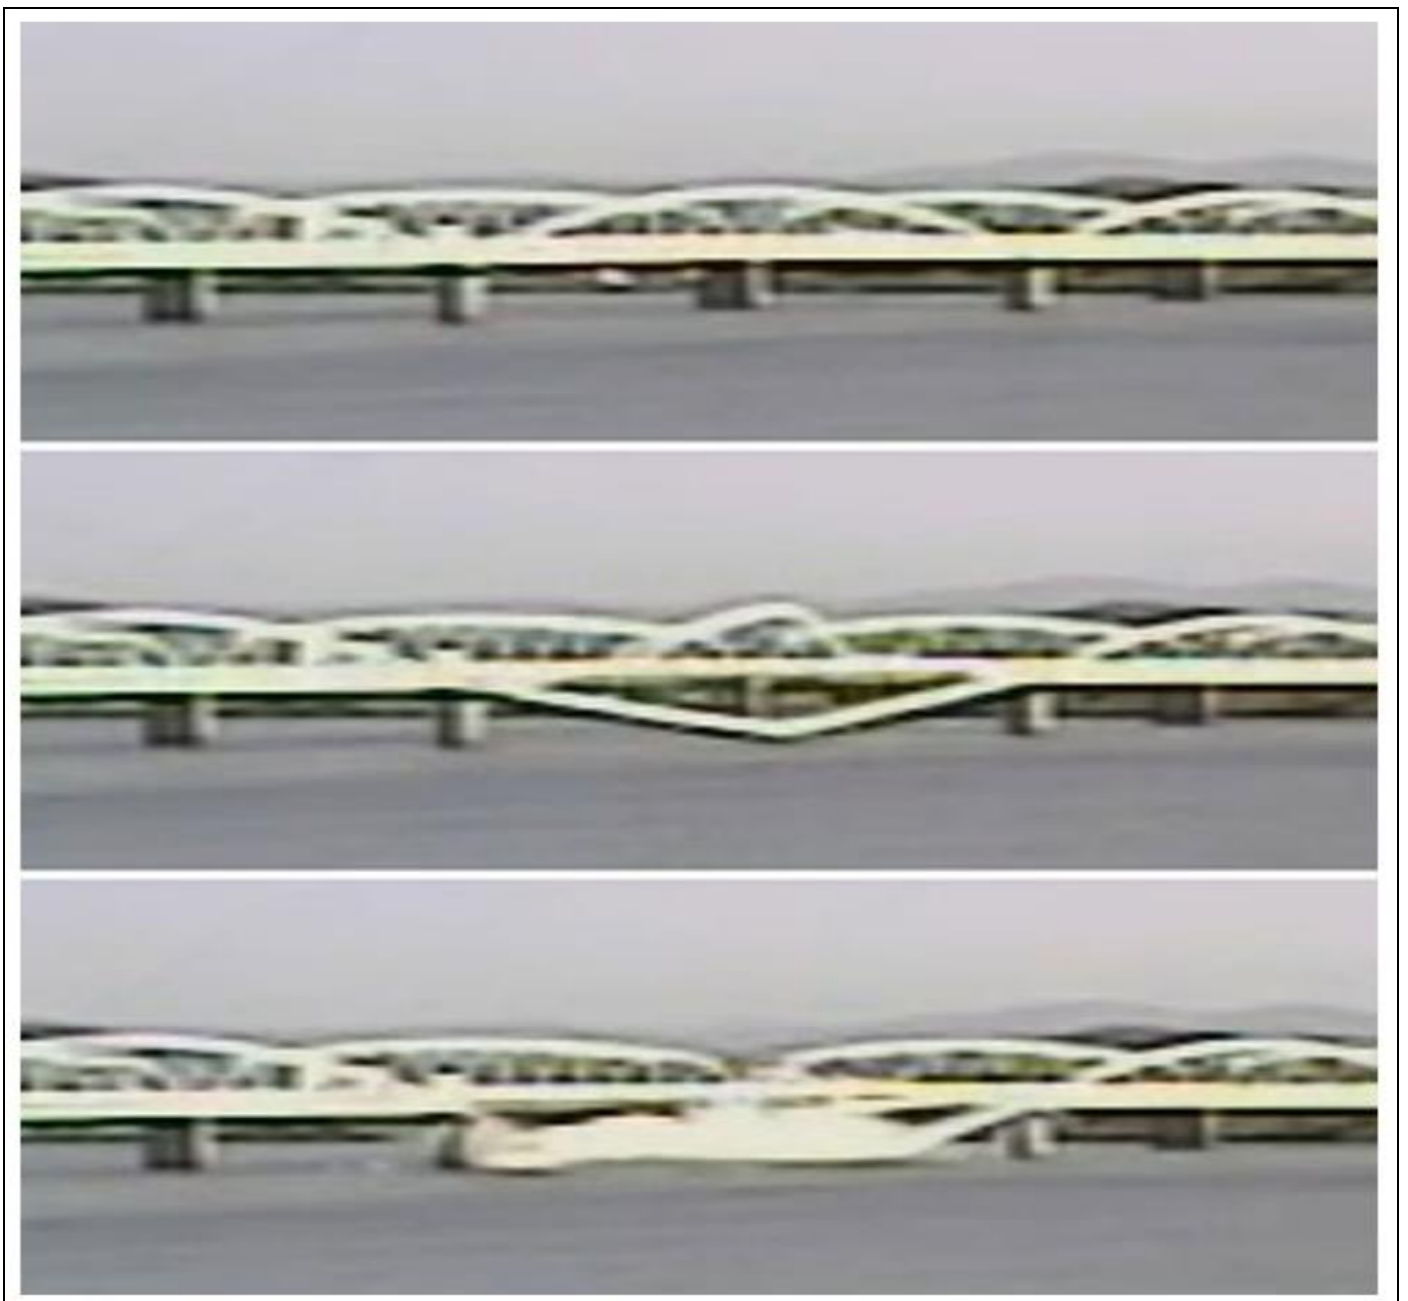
Wakayama Aqueduct Bridge Failure view of a Camera[6]
